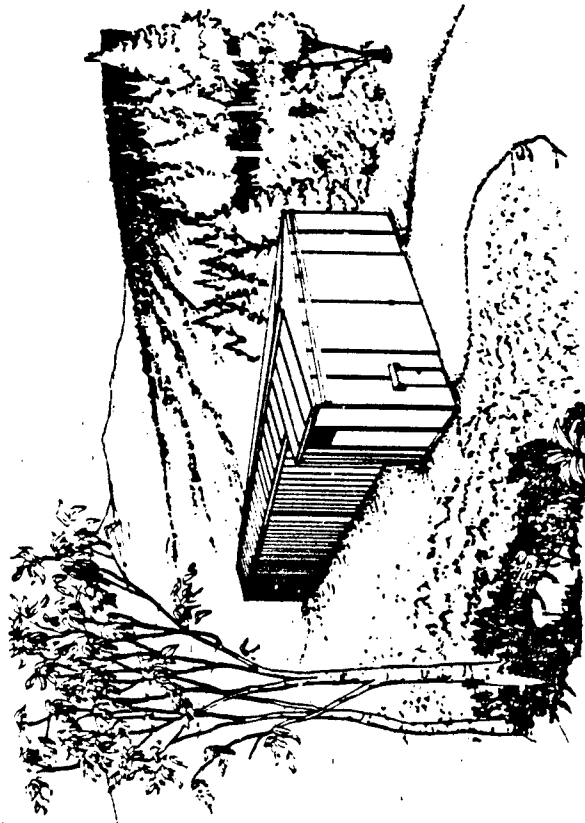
ELEVATION--METAL BASELINE BUILDING.
